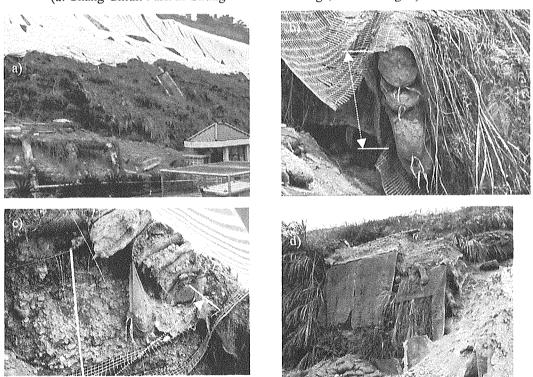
Damage to wrapped-around type reinforced-soil embankment (at National Chi-Nan University; site 8 in Fig. 1)
